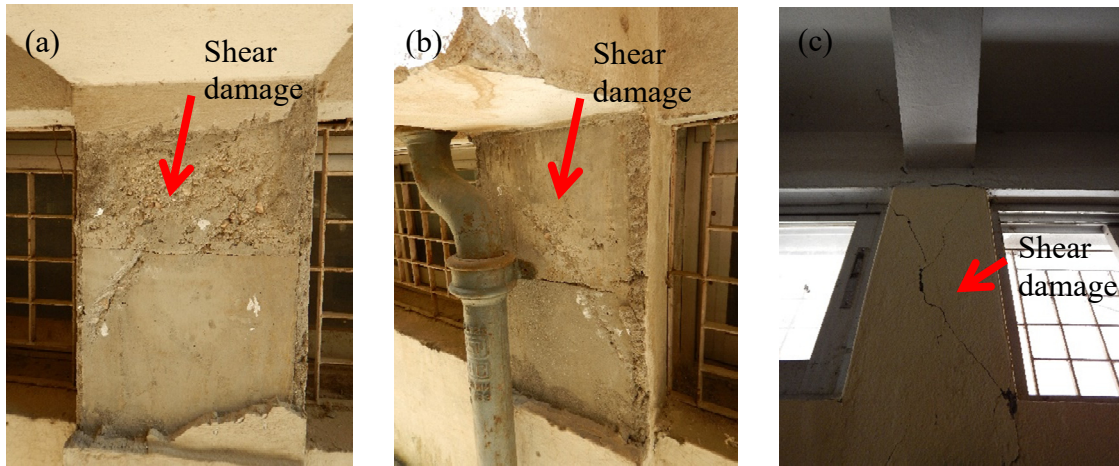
Tribhuvan University Thapathali Campus Block E Building – short column shear damage: (a) exterior; (b) exterior; (c) interior.
